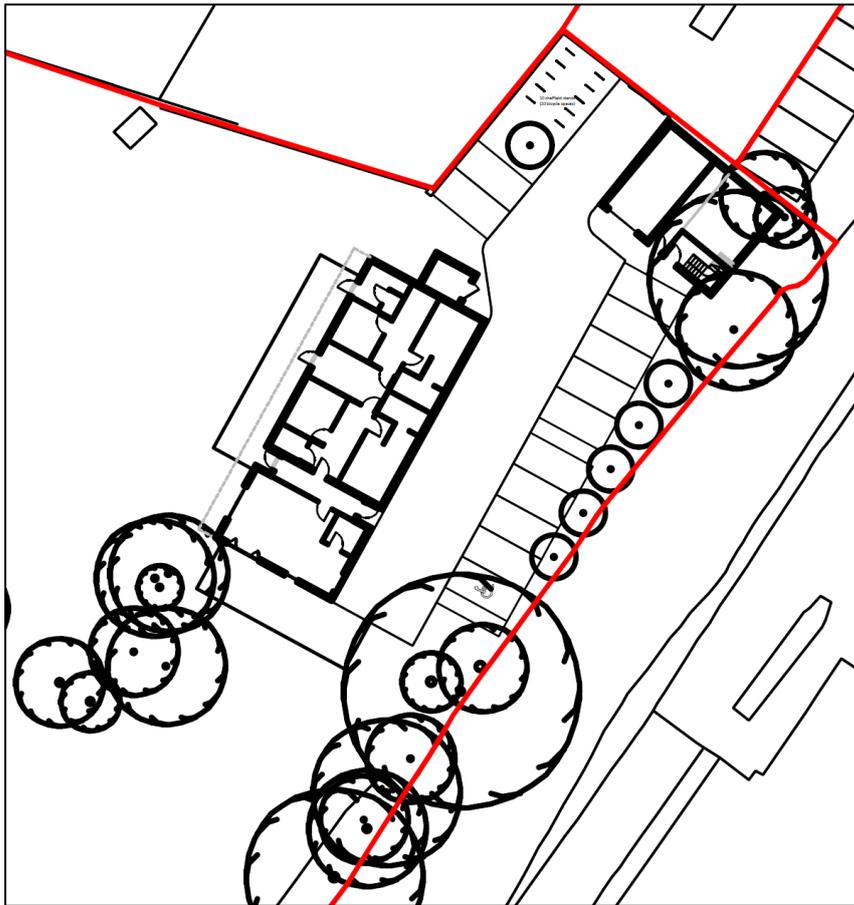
Proposed Site Plan (Pavilion, storage units and parking)
